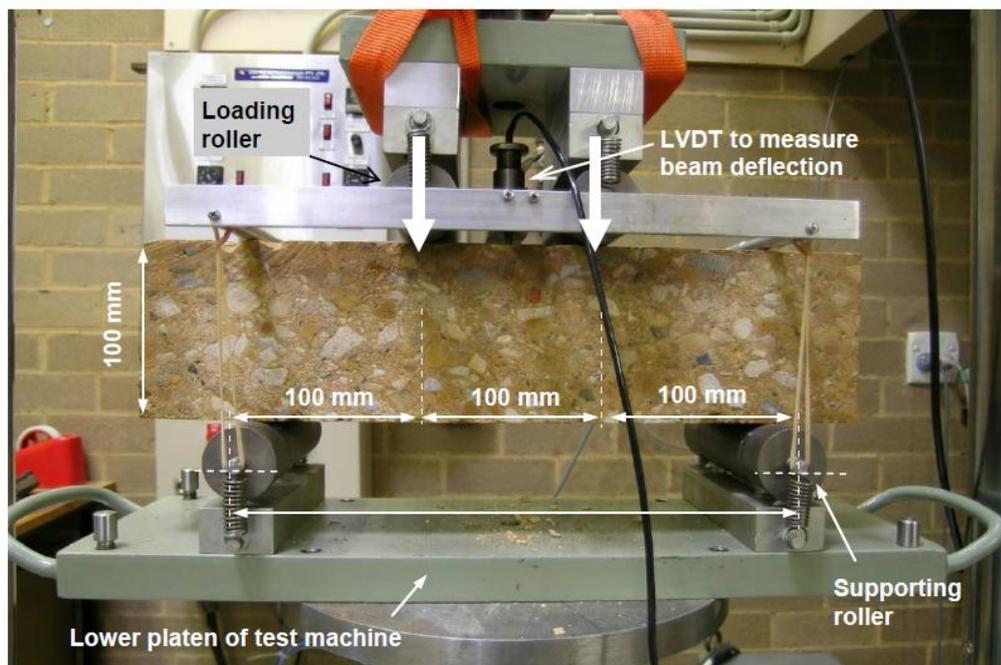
Flexural beam testing setup at the Australian Road Research Board
